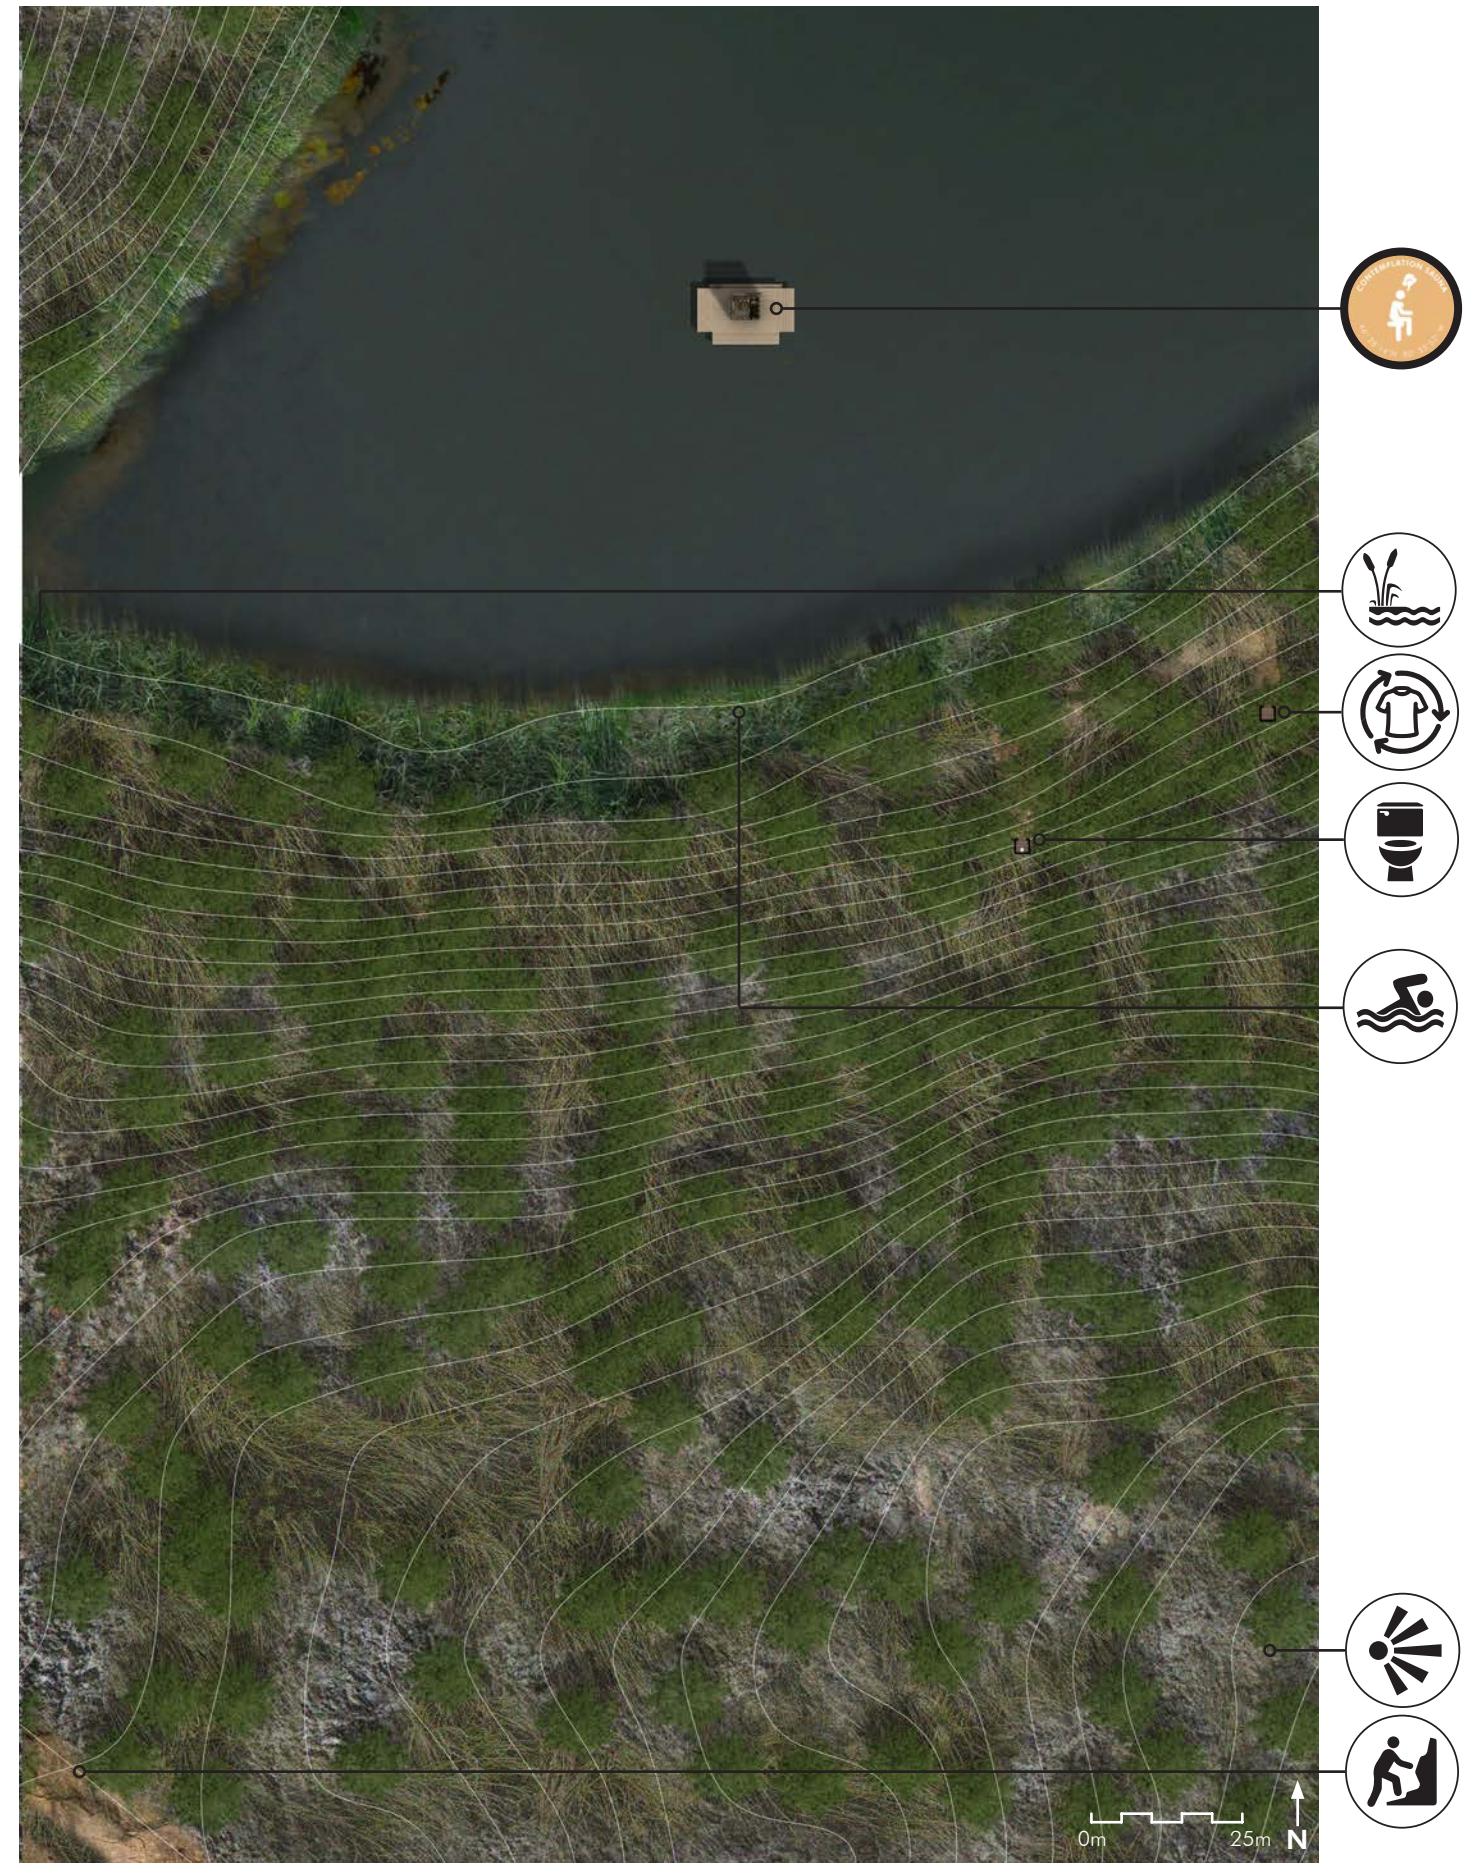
Contemplation Sauna - Site Plan. Image by author.
